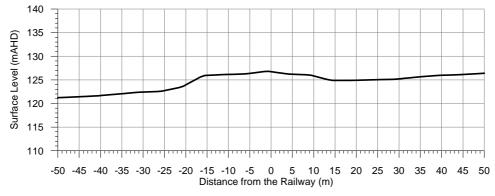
Cross-section through Embankment 73.4 km - Looking East (Up Track)
